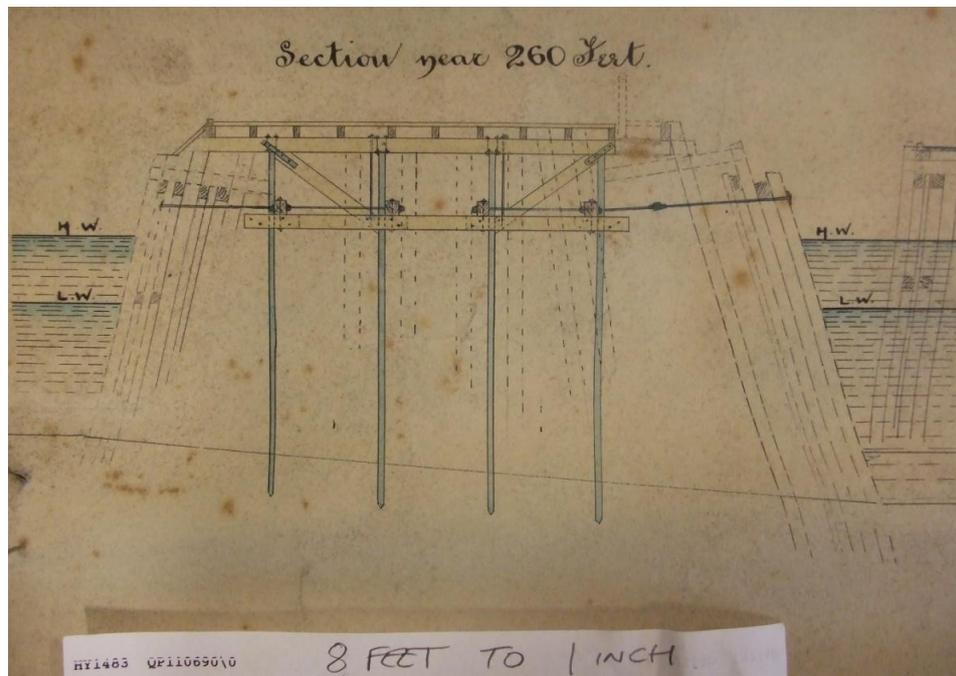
, 1893-4, Section through pier showing a new decking element (NRO Y/PH 1293)
